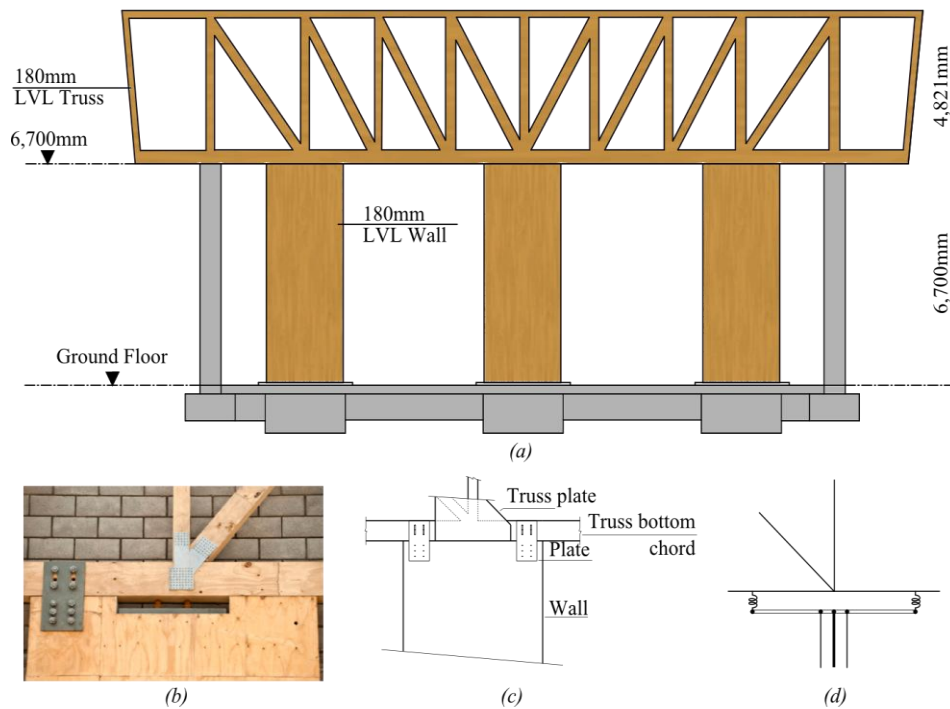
(a) Side view of truss-wall system; (b) Transverse wall connection during construction; (c) Sketch and (d) Model of the truss-to-wall connection
